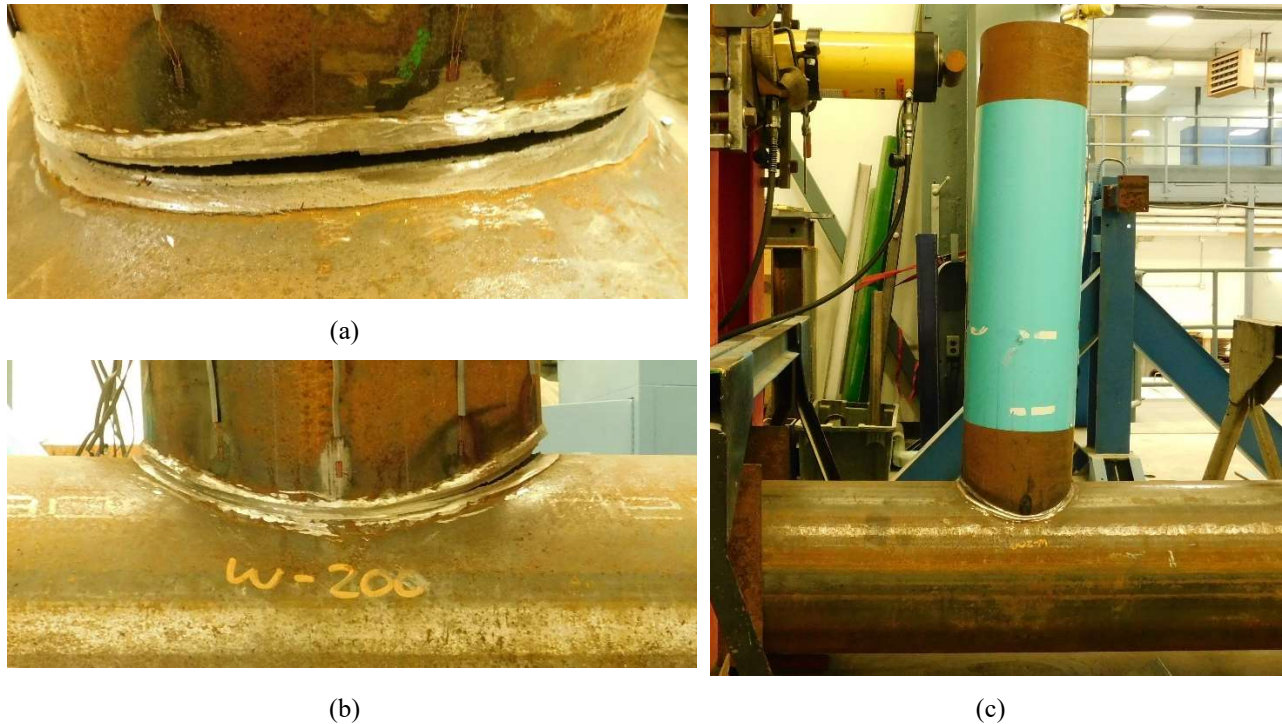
Failure of T406-273-0.7P (a) weld fracture, (b) chord deformation and (c) branch deformation
